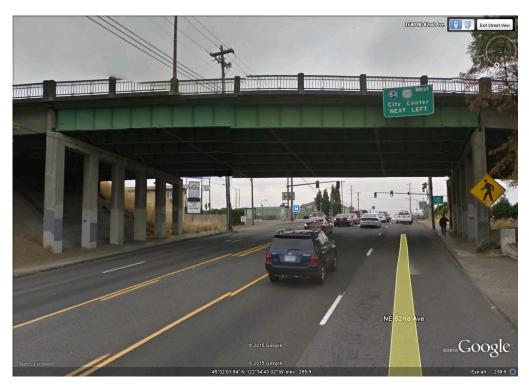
NE Halsey Street Ramp Undercrossing Southbound
